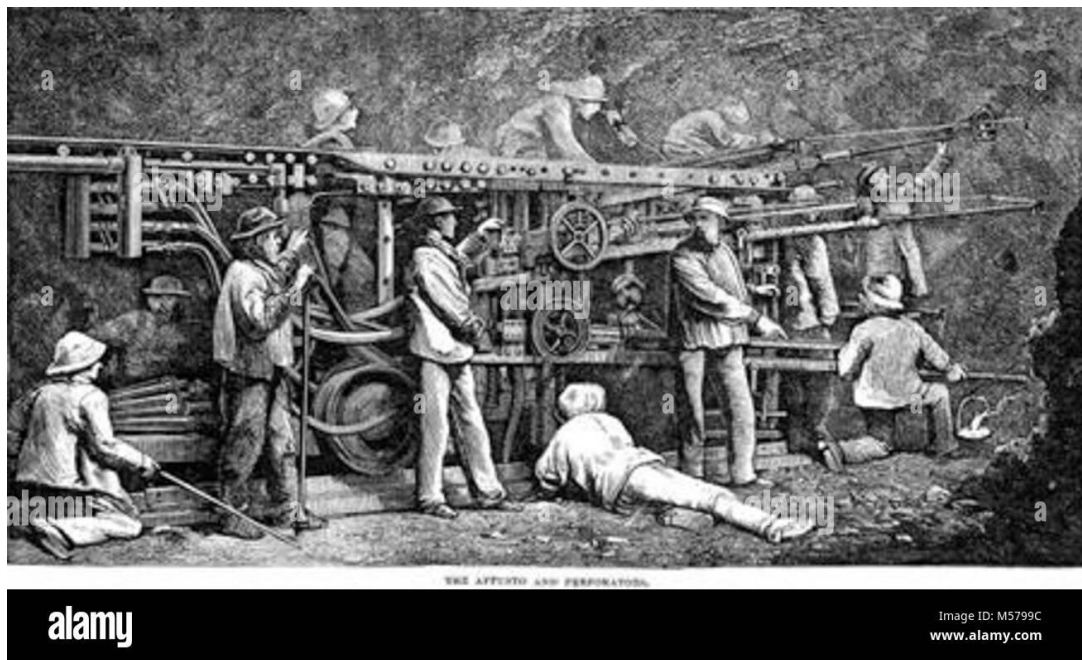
Pneumatic Drilling Machine. www.alamy.com
